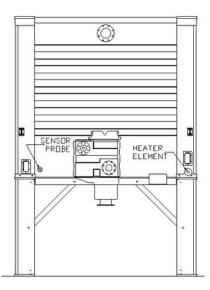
Immersion Basin Heater and Sensor Probe Location
